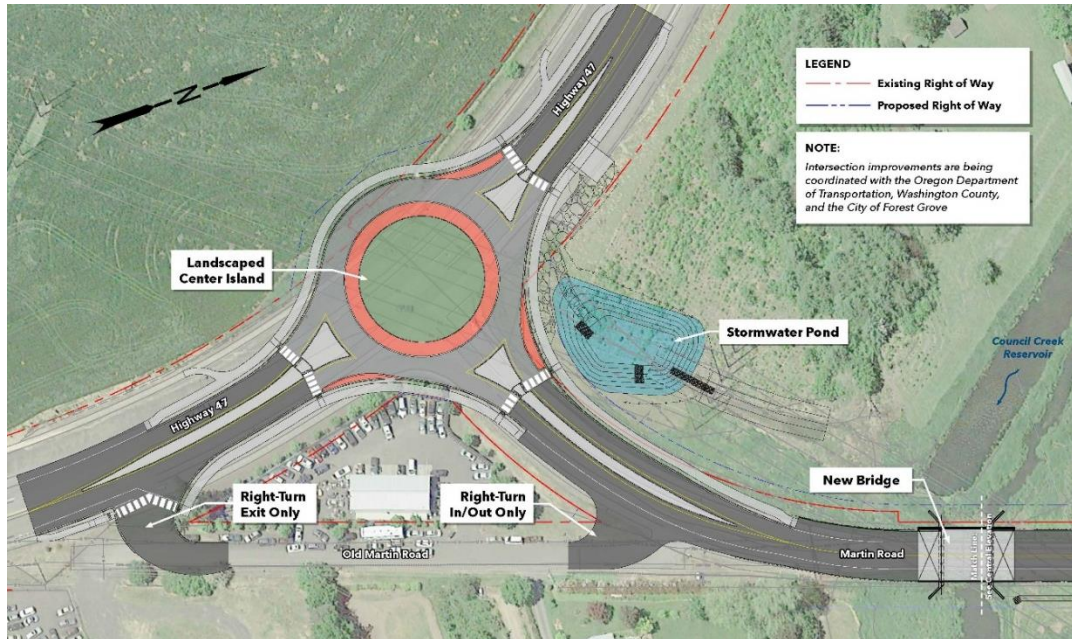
OR 47 at Martin Road – Proposed Roundabout Improvement
